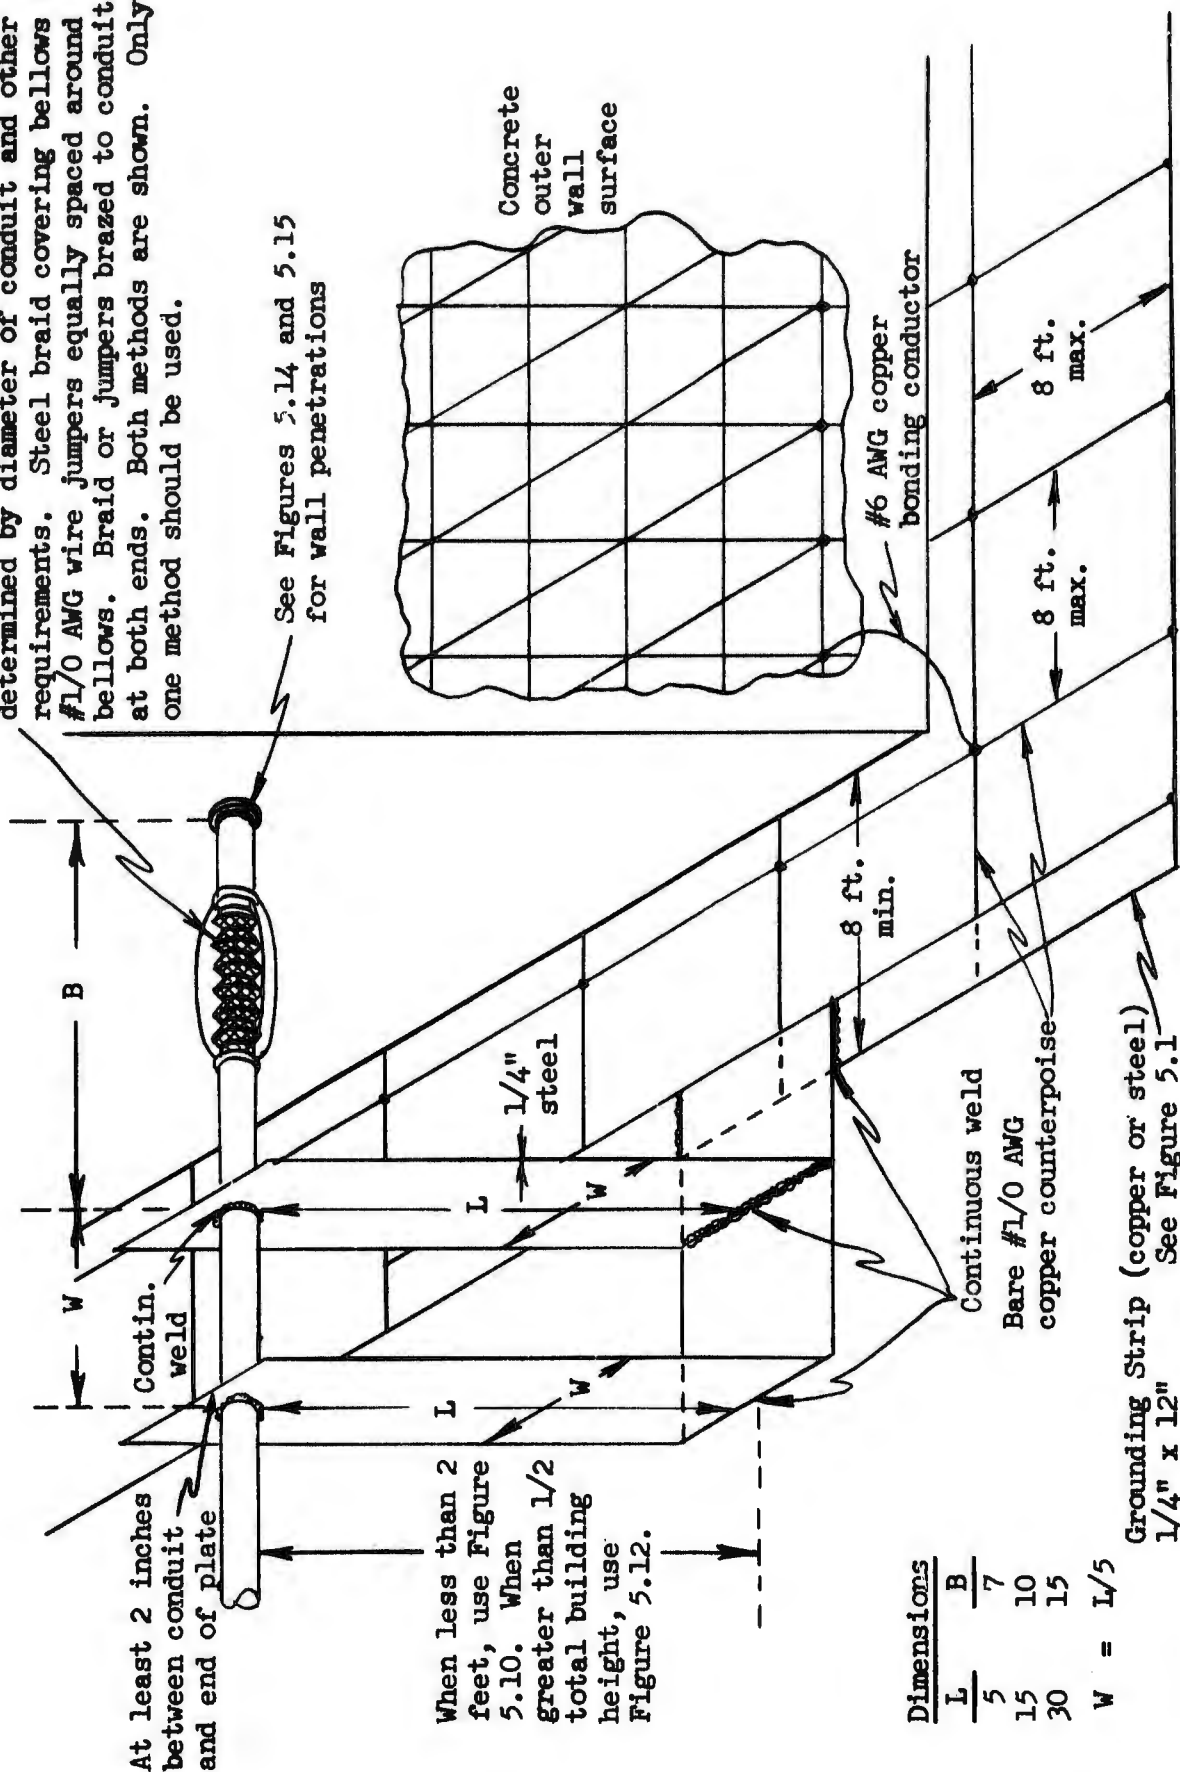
Conduit or Pipe Ground Connections at Counterpoise for Penetrations at an Unshielded Wall or Wall Shielded with Rebars or Welded Wire Fabric at Elevations Above the Counterpoise. Does not apply for overall metal shielded buildings and conduit penetration heights greater than 1/2 the total building height.
